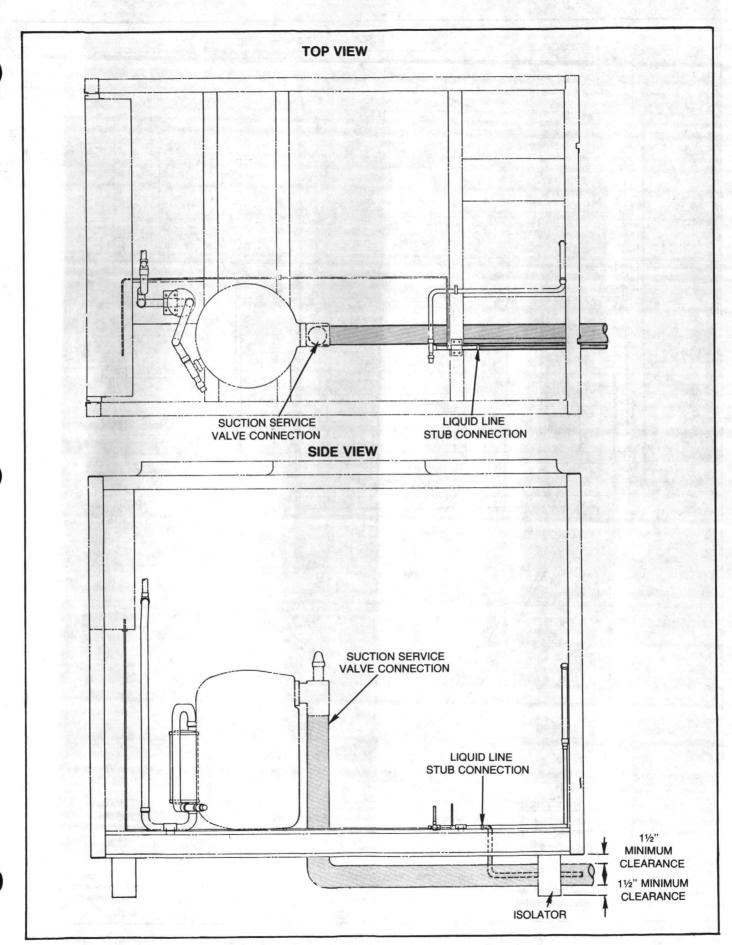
Piping Installation: 20 Through 30-Ton Units With Isolators
